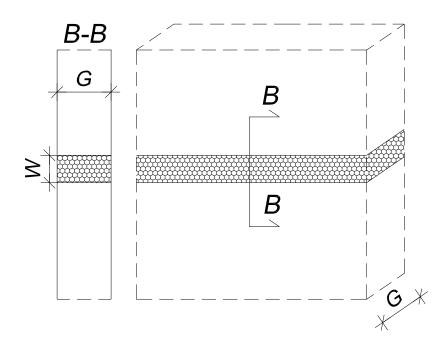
View and cross-section of the vertical linear joint seal in wall
